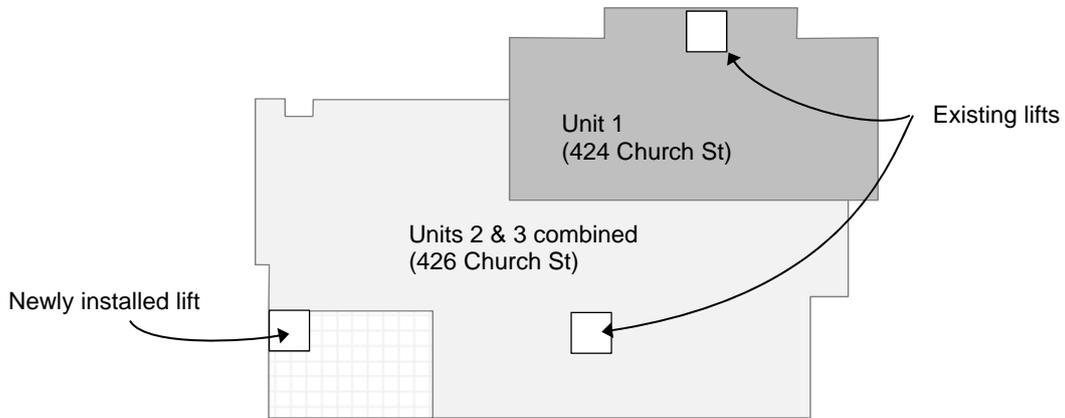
Level 2 plan (approx): residential units (not to scale)
